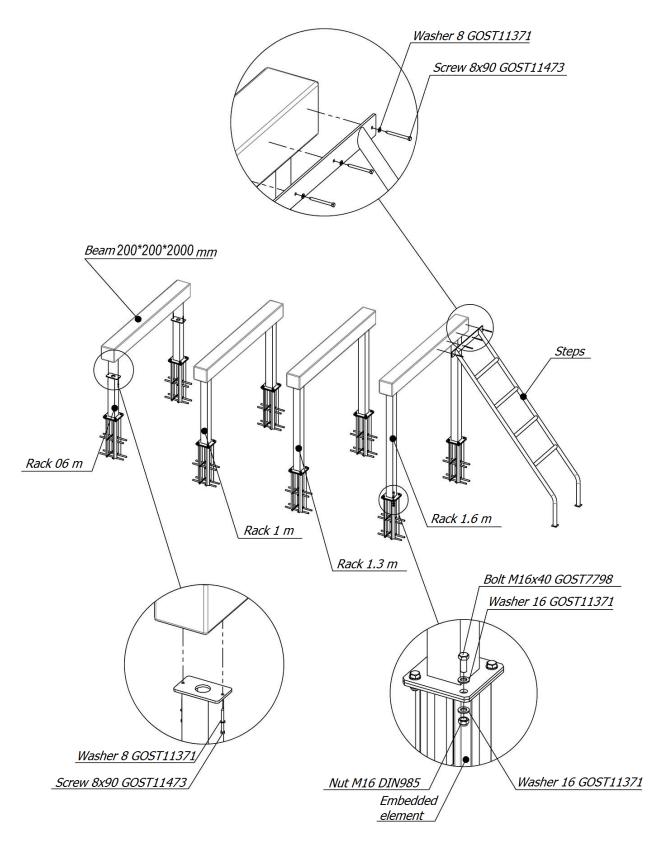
Assembly scheme of «Wall-destroyed bridge №2»
